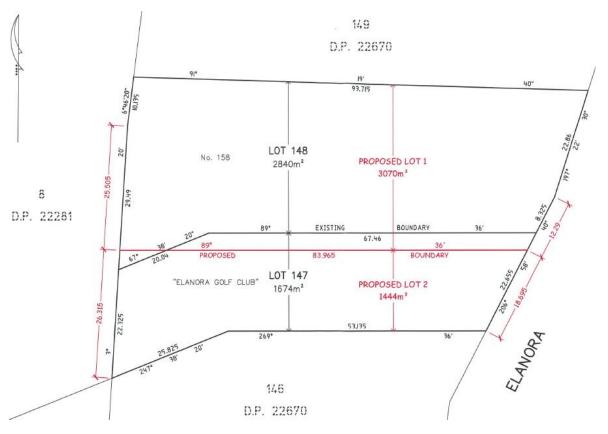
excerpt of site survey plan. The existing tennis court encroaches on the adjacent southern allotment (Lot 147 in DP 22670).
